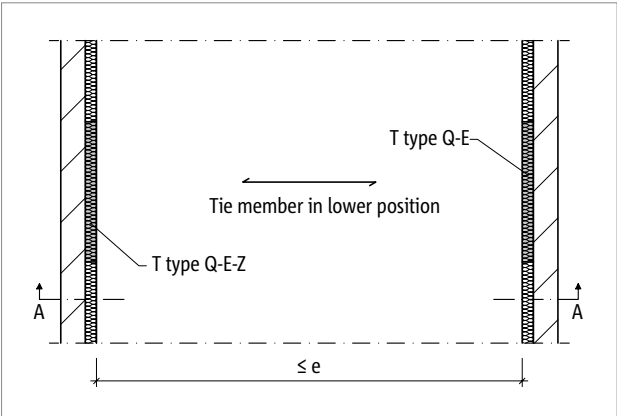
Schöck Isokorb® T type Q-E, Q-E-Z: Reinforced concrete slab tensioned in a single axis
